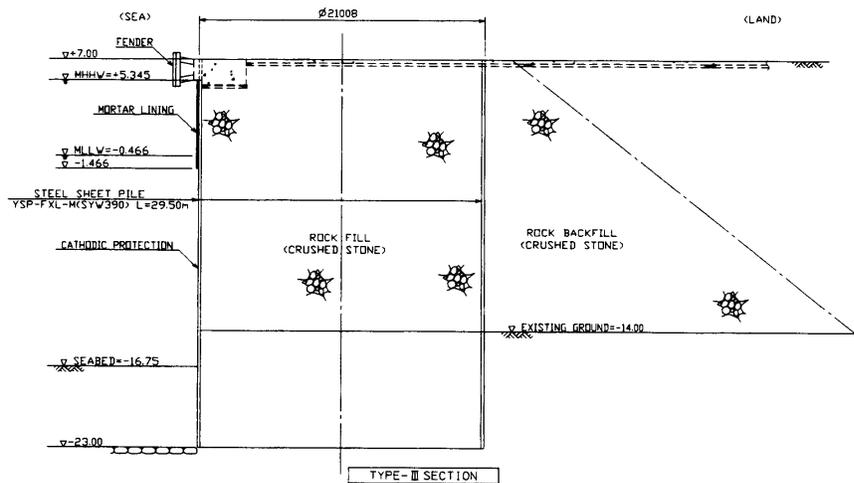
Typical Cross Section for Quaywall Side
